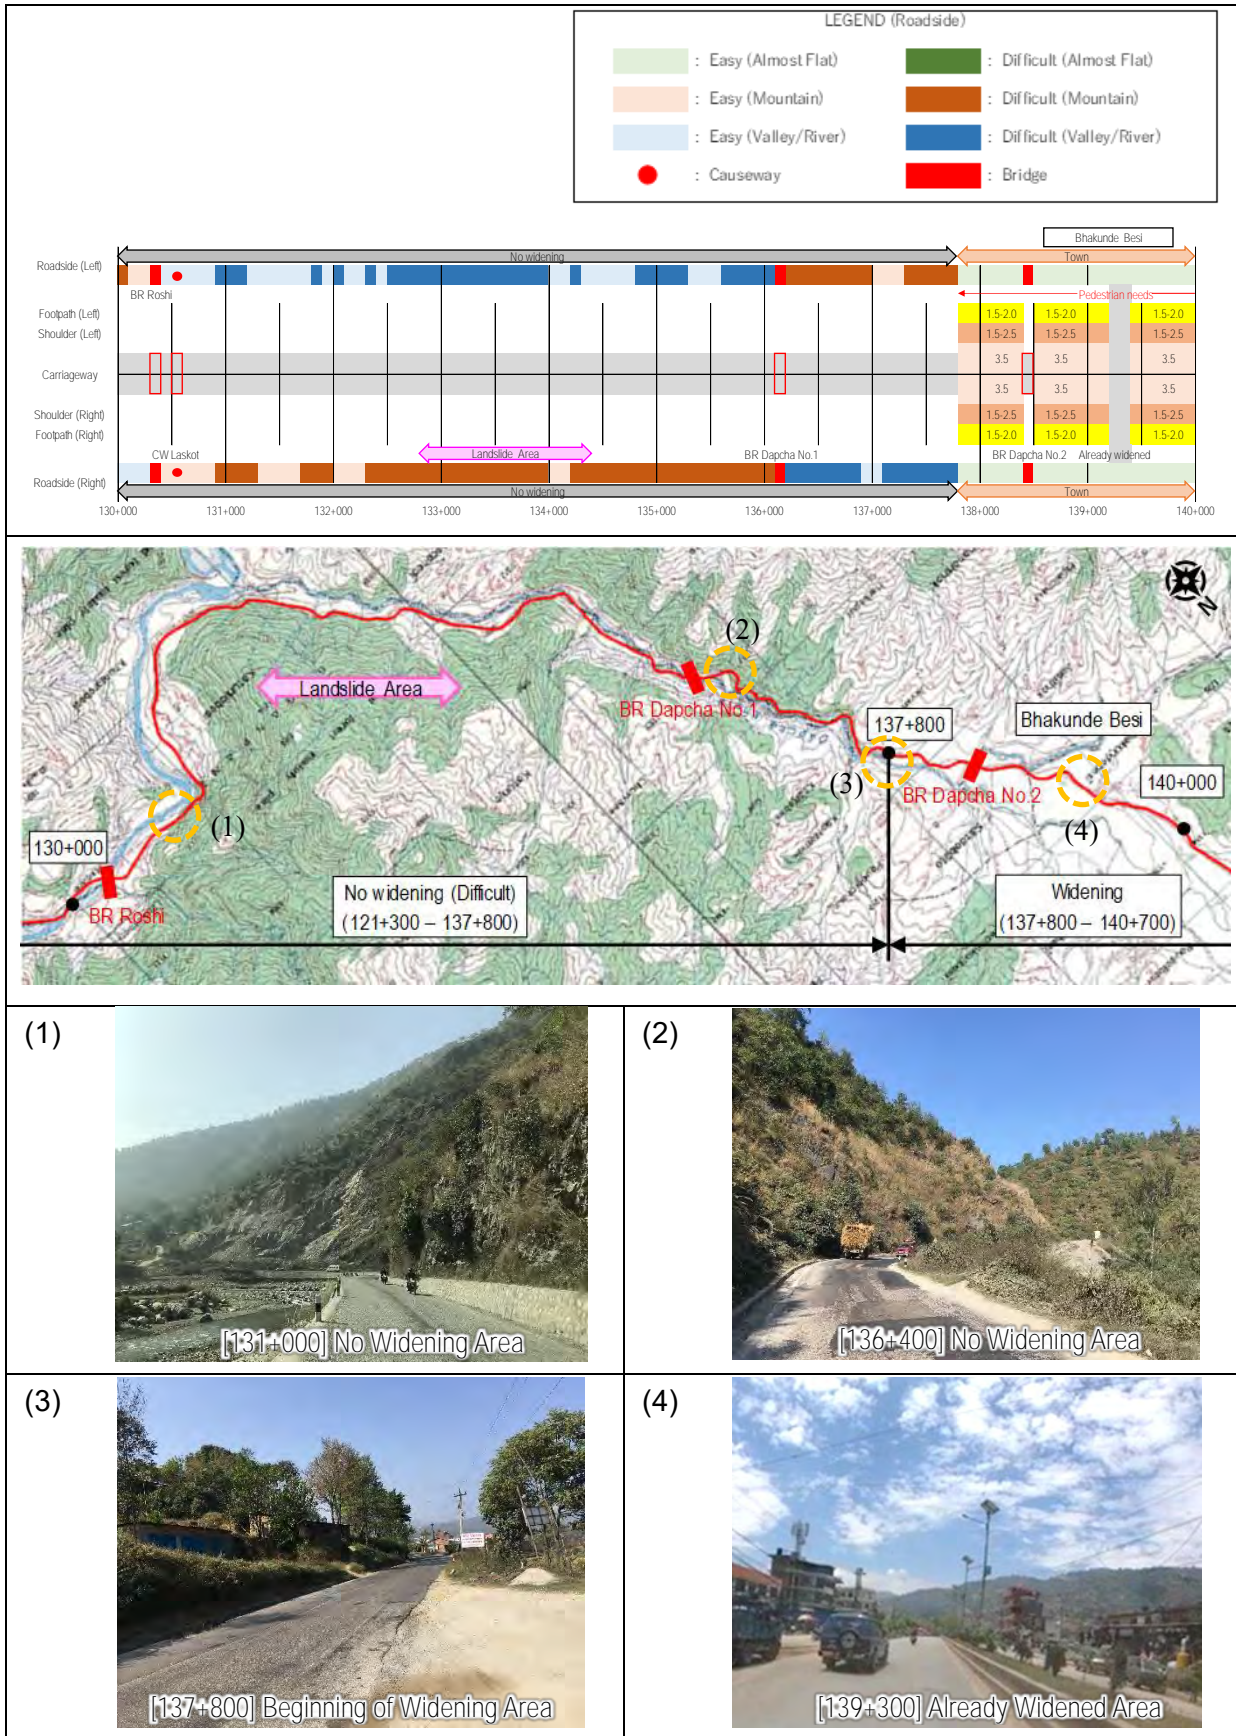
Example of Application of Cross Section Type (Ch.130-140km)
